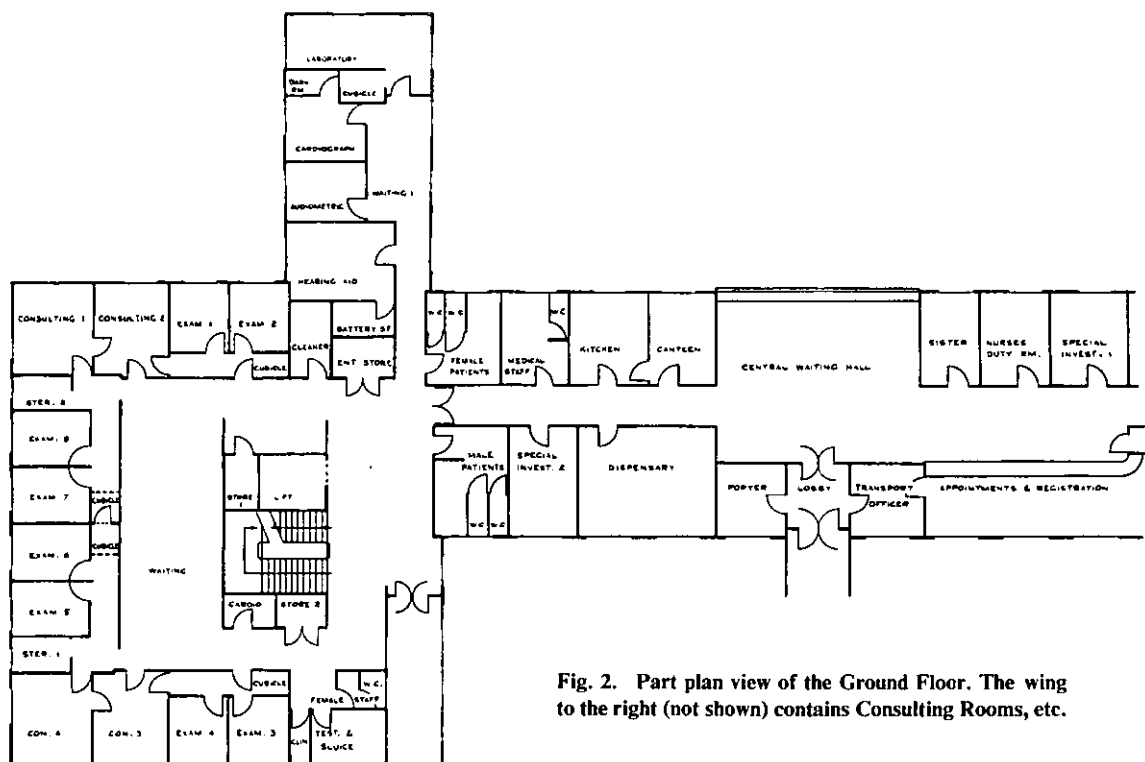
Part plan view of the Ground Floor. The wing to the right (not shown) contains Consulting Rooms, etc.
